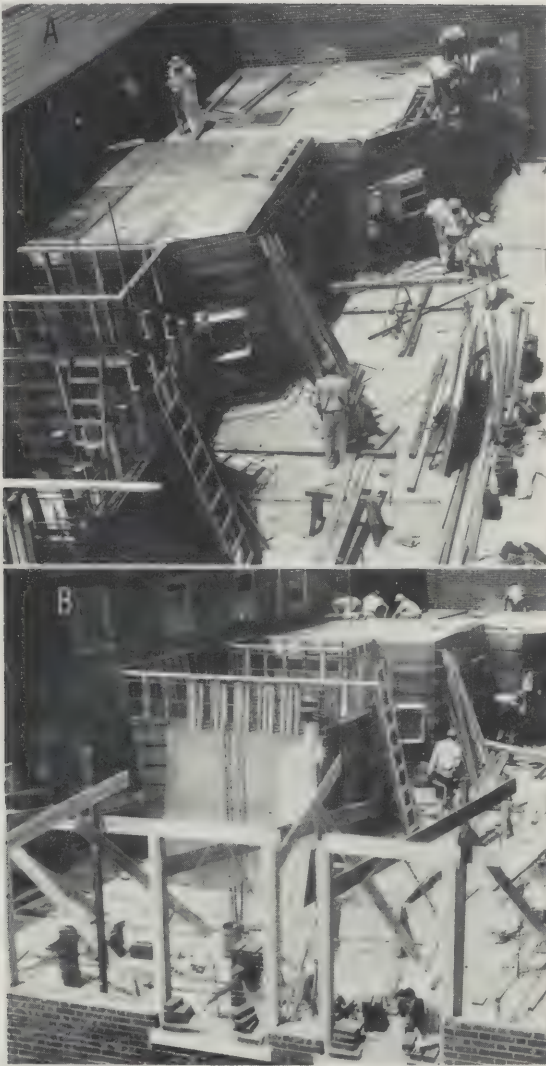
Construction of new wing at Walter Reed General Hospital for Radiation Therapy Section. A. Construction of wooden forms before pouring concrete. The million-volt room, with 18-inch thick walls, is the most distant structure. Frame of viewing window can be seen. Middle room is for 200-kv. machine and nearest room, for superficial radiation therapy. B. Another view of the construction work.
